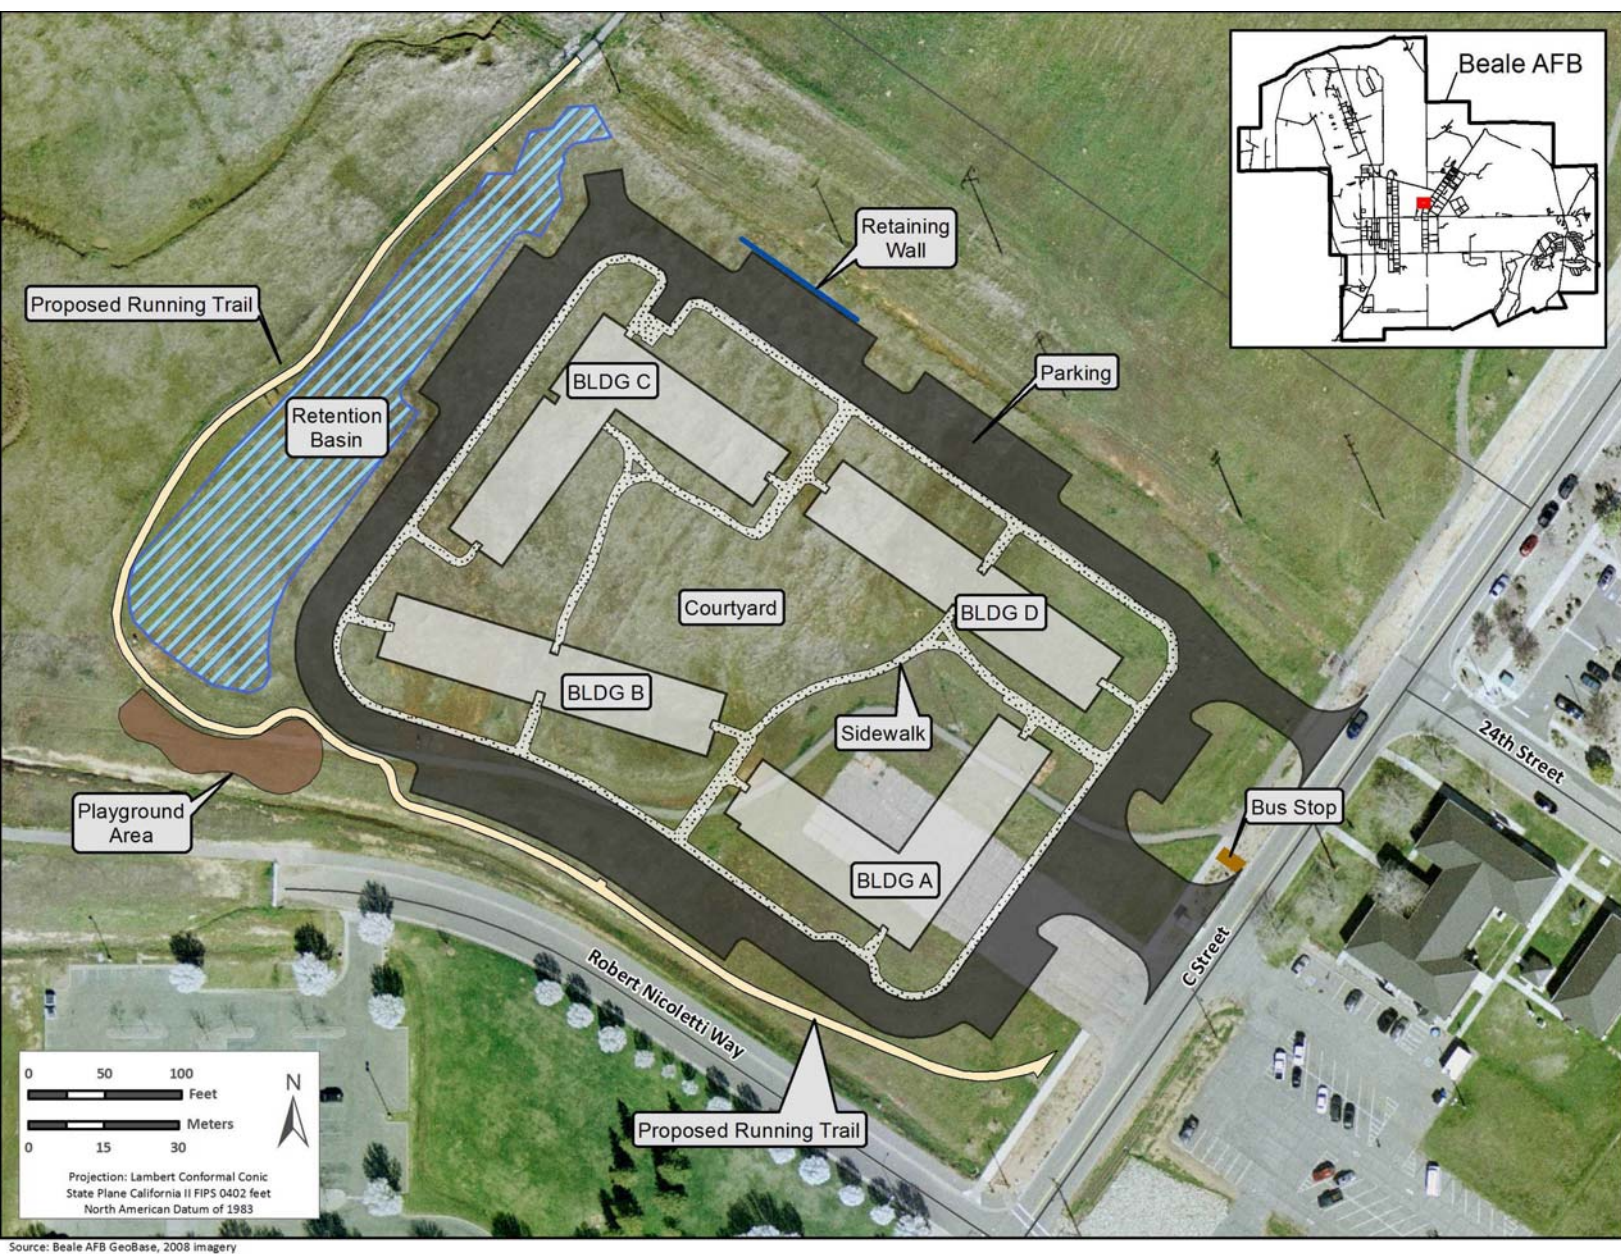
Proposed Site Layout for Temporary Lodging Facility
